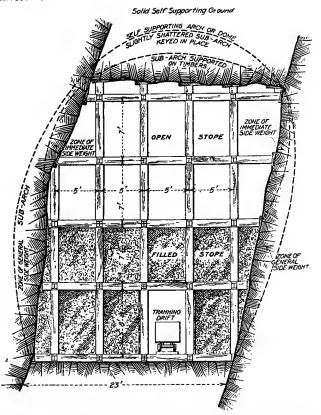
CROSS SECTION OF TIMBERED AND PARTLY FILLED STOPE, SHOWING ZONES OF WALL AND BACK ARCHING
